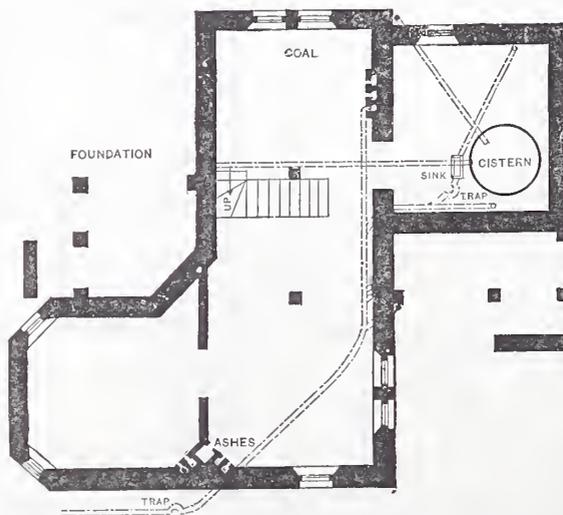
Cellar and Foundation Plan.—Scale, 1-16 Inch to the Foot.
